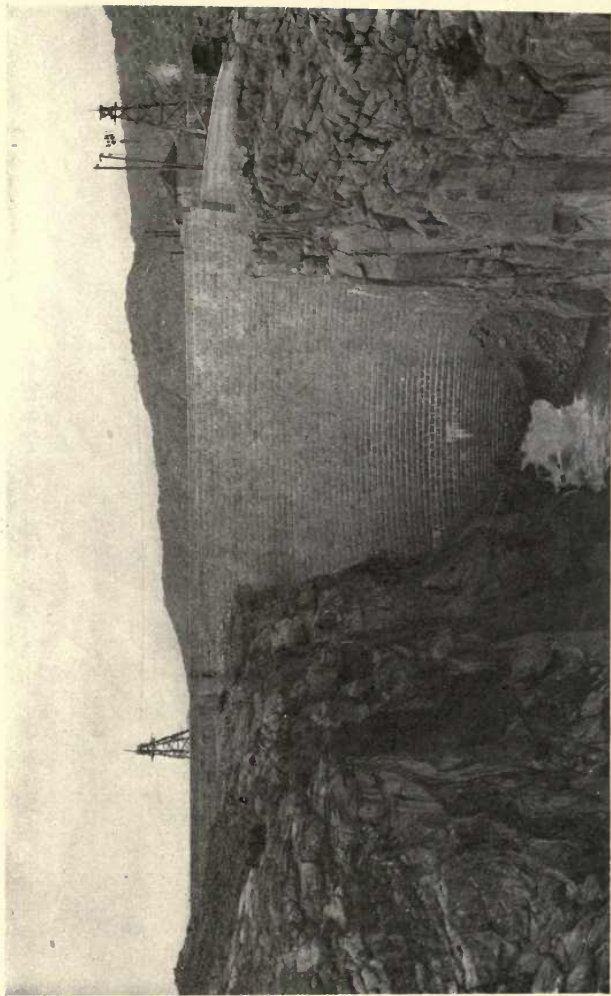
Pathfinder Dam, looking upstream, North Platte River, Wyoming.
